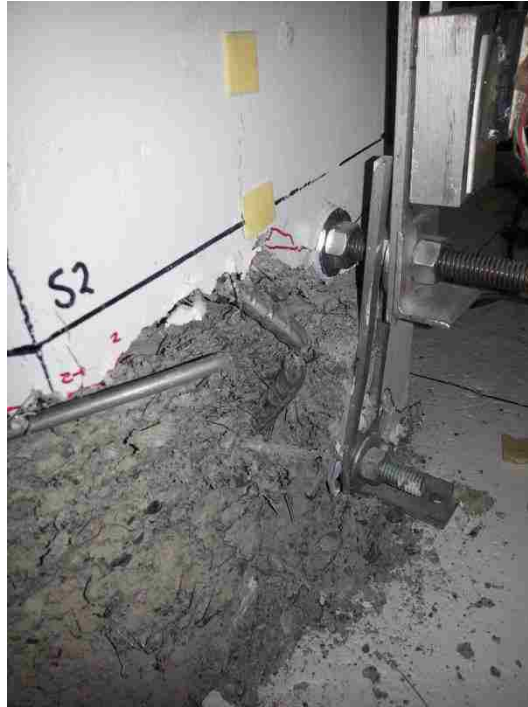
PreT-SS broken longitudinal rebar and broken spiral after spalled concrete had been peeled off after the test was finished.
